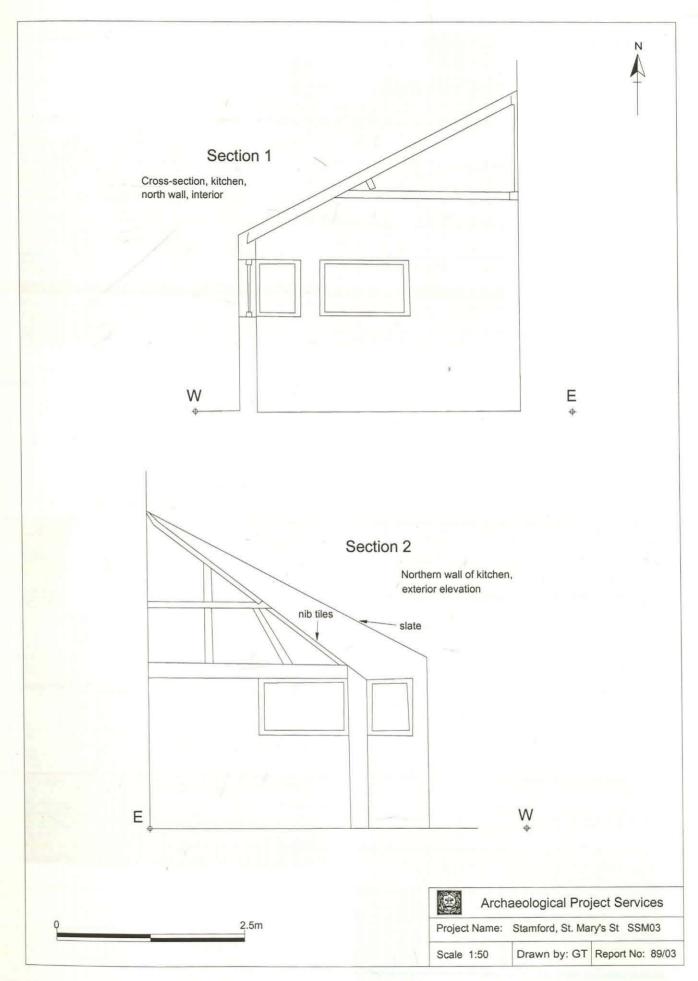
Interior and Exterior Elevations of Kitchen North Wall (approximate only)
